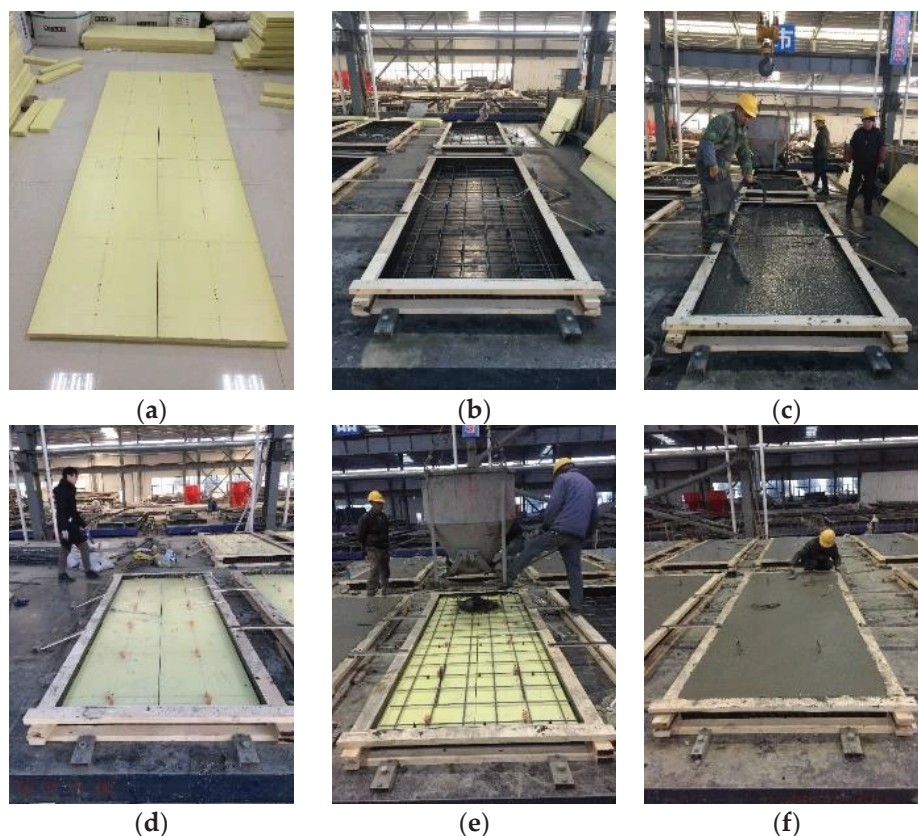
Fabrication and casting process of sandwich wall panels: (a) Cutting and splicing XPS insulation layer; (b) Laying steel mesh of inner concrete wythe; (c) Pouring and vibrating inner concrete wythe; (d) Arranging insulation layer and inserting SGCCs; (e) Laying the steel mesh of outer wythe and pouring concrete; (f) Smoothing and finishing the concrete surface.
